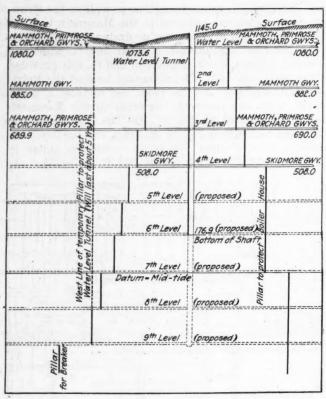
LONGITUDINAL SECTION OF SHAFT PILLAR
